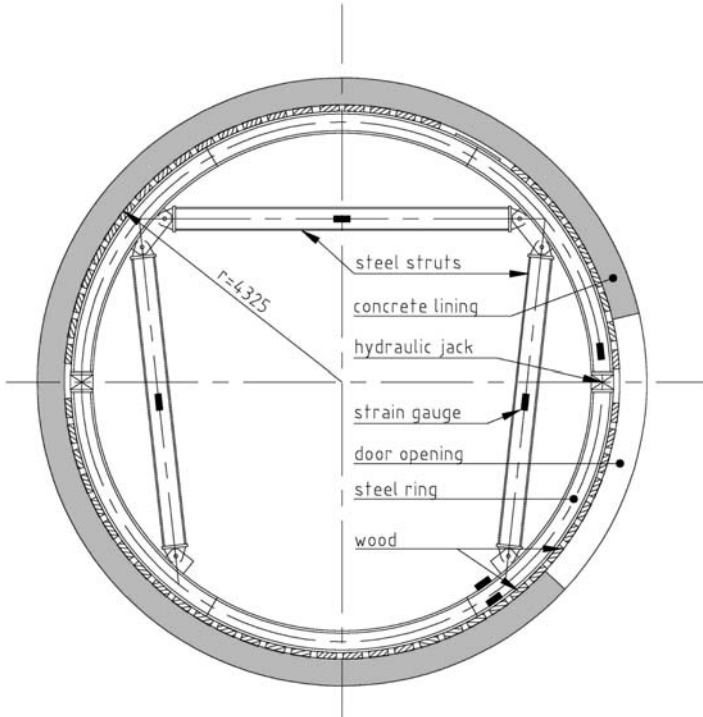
Sketch of the prestressed steel rings at cross connection 2.
